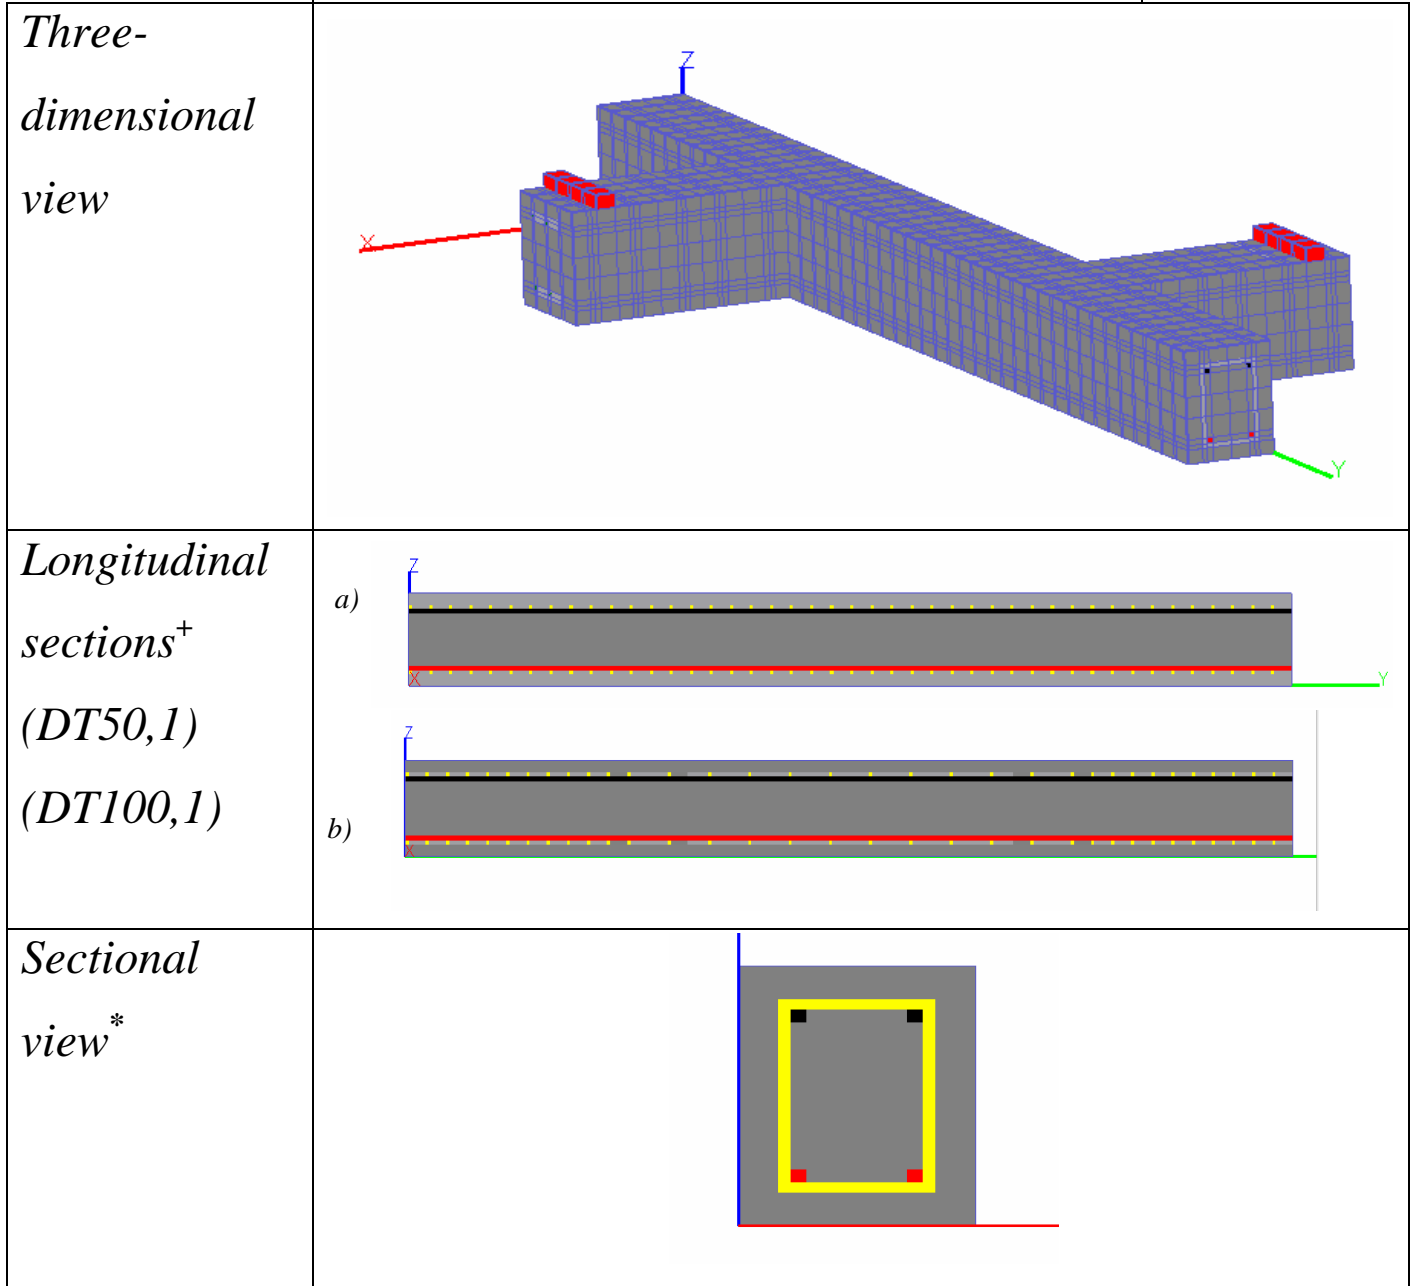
Sectional views for specimen DT50, 1 and DT100, 1
